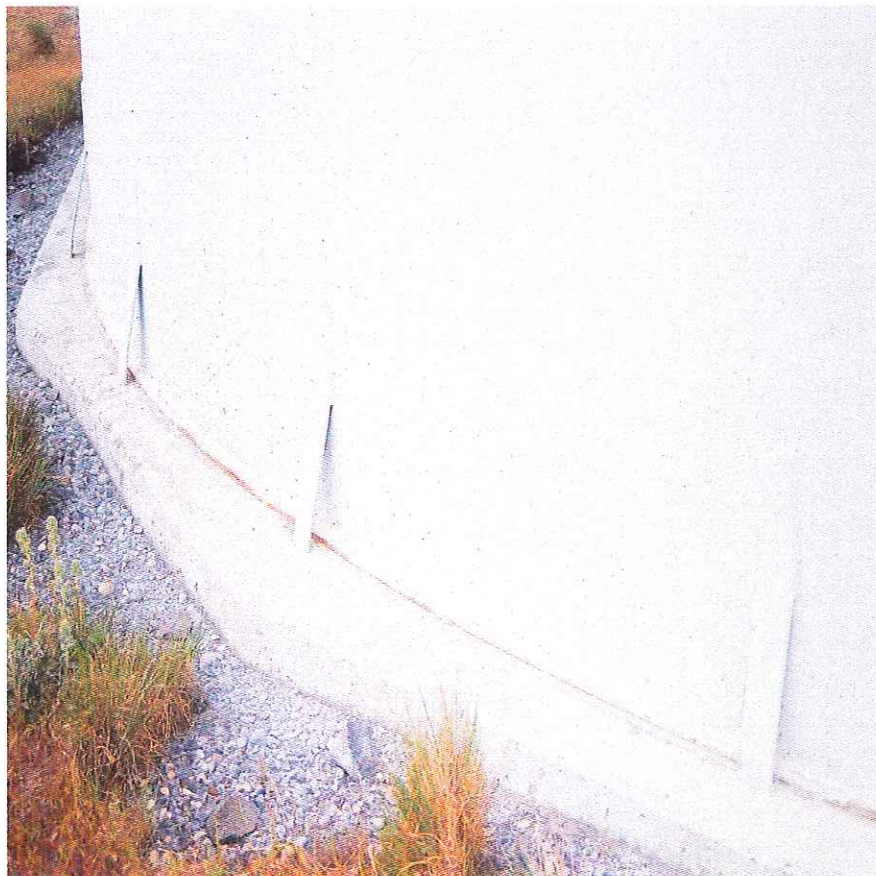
Straps embedded in the tank foundation were joined with fillet welds to the lower wall plates.
